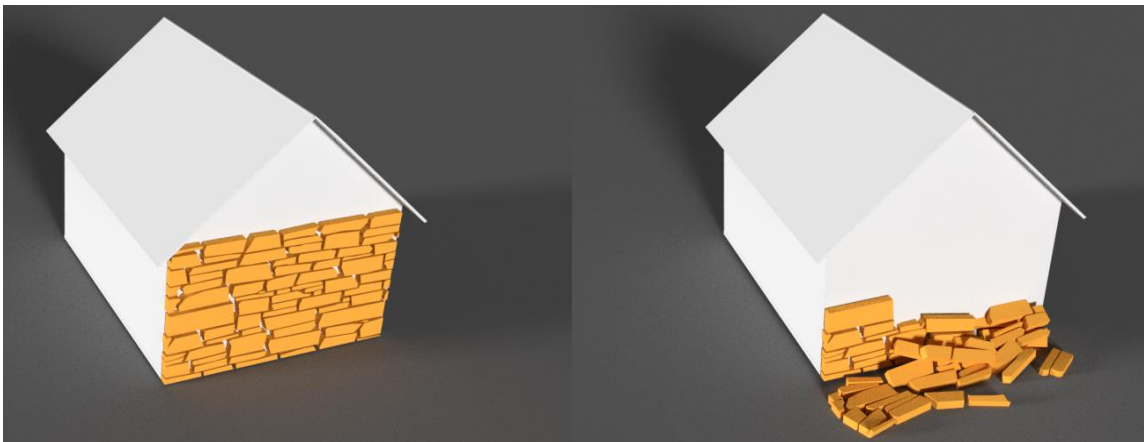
DEM simulation of a masonry wall collapse before and after earthquake excitation.
